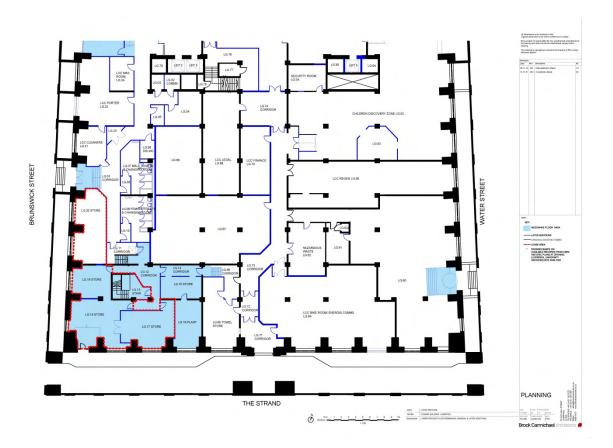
Lower Ground Floor Remaining Original & Later Additions
